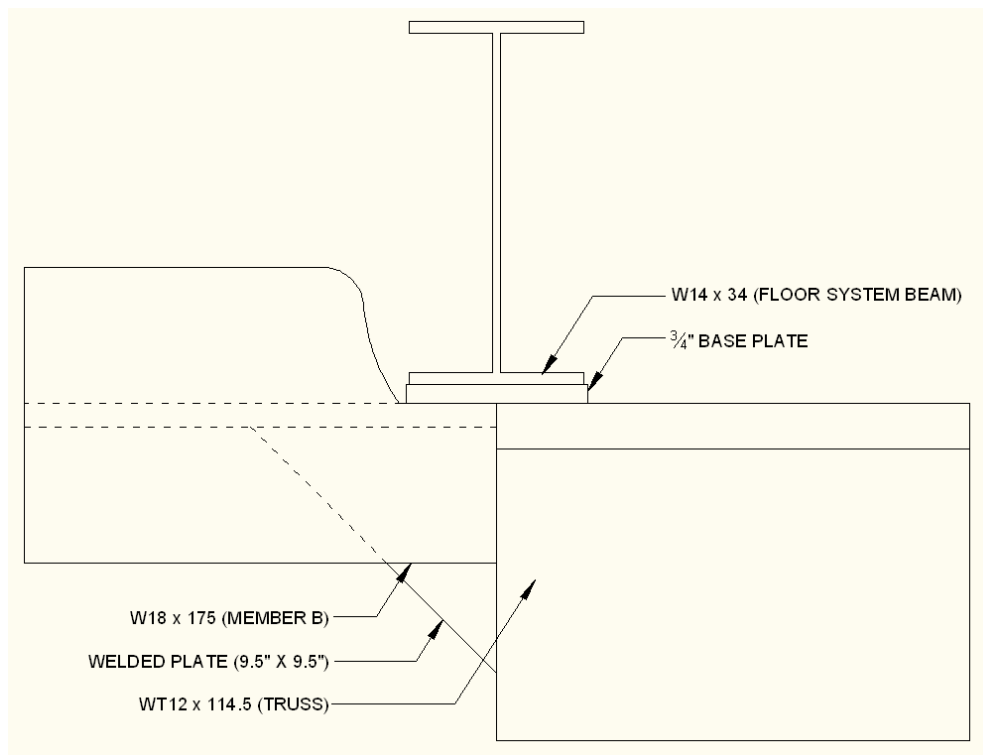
Connection of Floor System Beams and Member B/Rest of Truss
